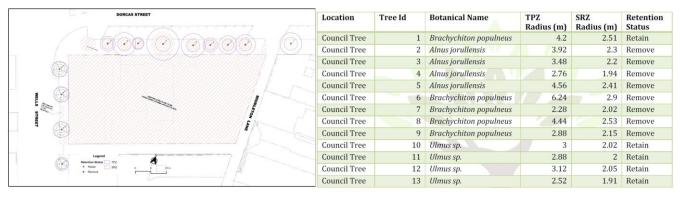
Street tress. Trees 2-9 are proposed to be removed (Source: Arboricultural Assessment and Tree Management Plan)
